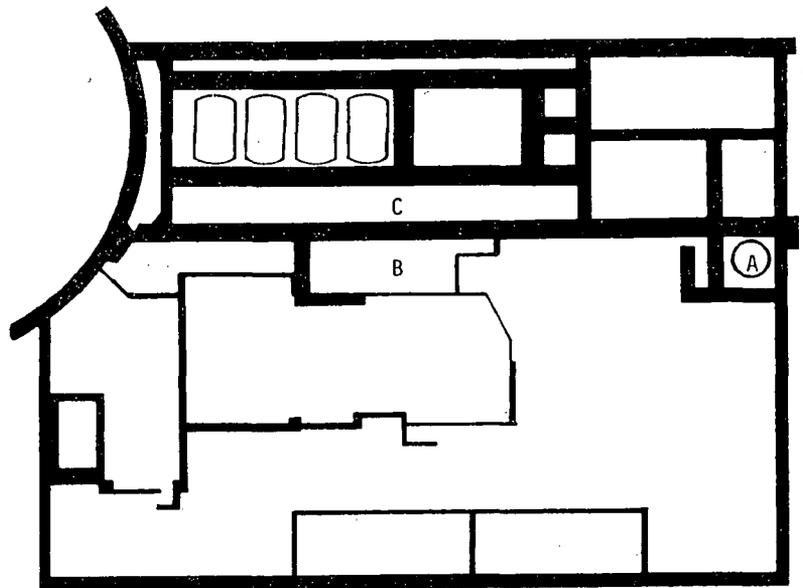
Auxiliary and Fuel Handling Buildings, 328-Foot Elevation.
